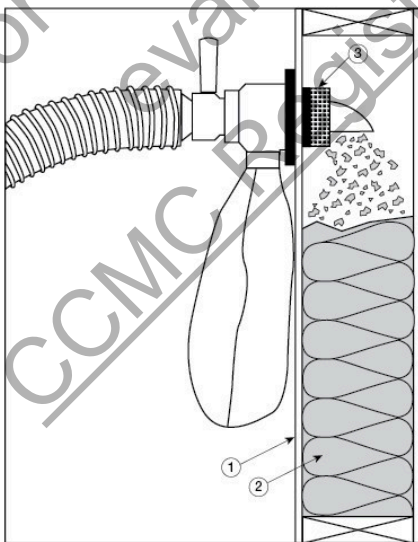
"IGLOO Wall Insulation" - 360 HD cellulose cavity fill method (vapour barrier)
